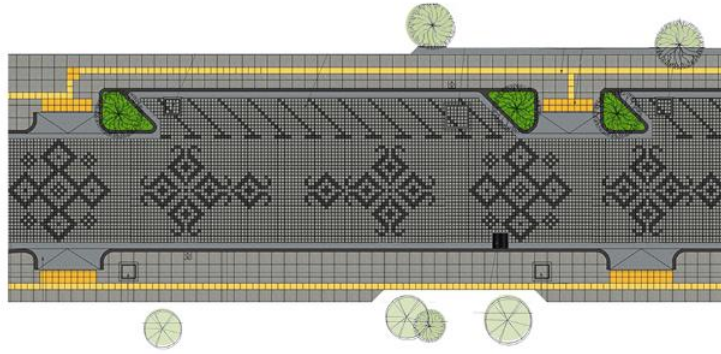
Part Plan showing pavement on either side, street parking and Kasuti patterned carriageway
